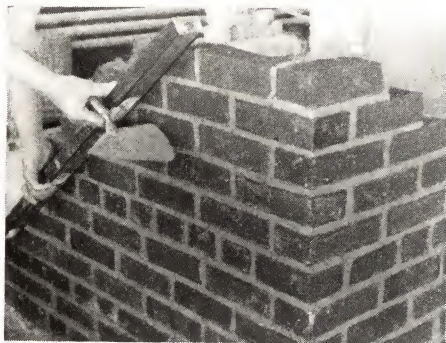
Truing the "tailing" of the outside tier of a 13-inch hollow-tile backed wall.
